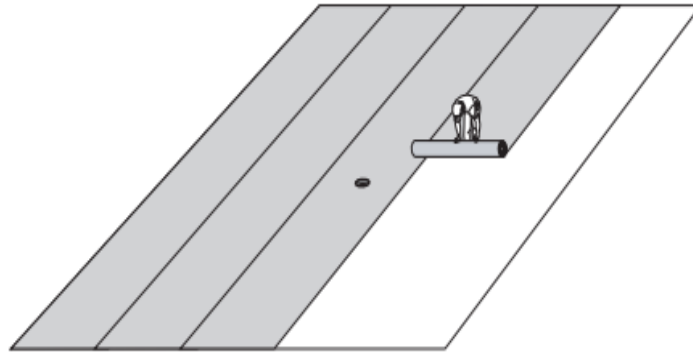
Installing water proofing, root barrier ,and protection material layers[43] .
